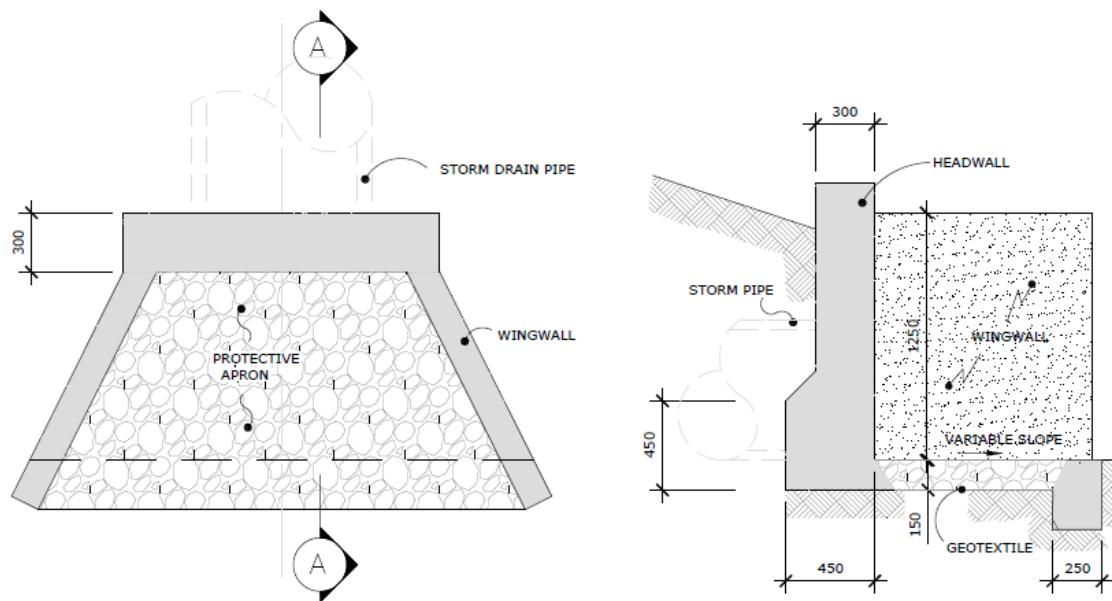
Headwall details: plan of headwall (left) and section A-A (right)
